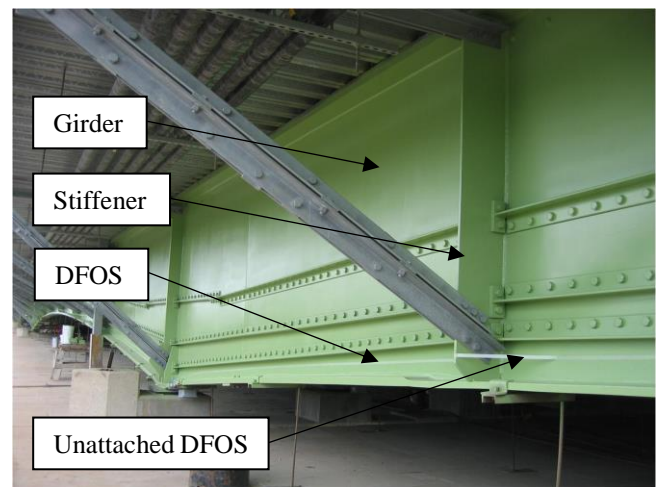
Steel girder with welded stiffener and DFOS in current monitoring system
